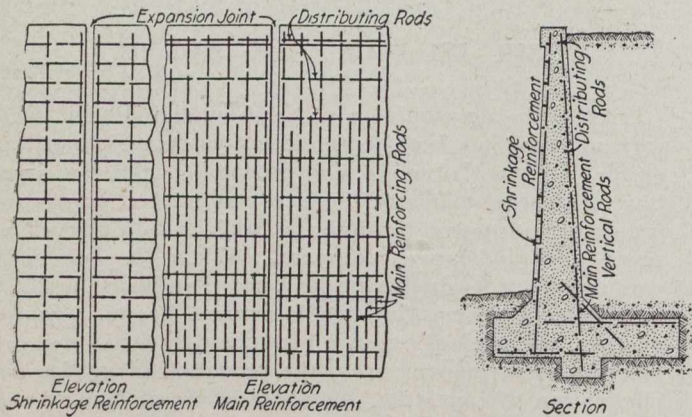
Expansion Joint in a Reinforced Concrete Retaining Wall of the Cantilever Type.
